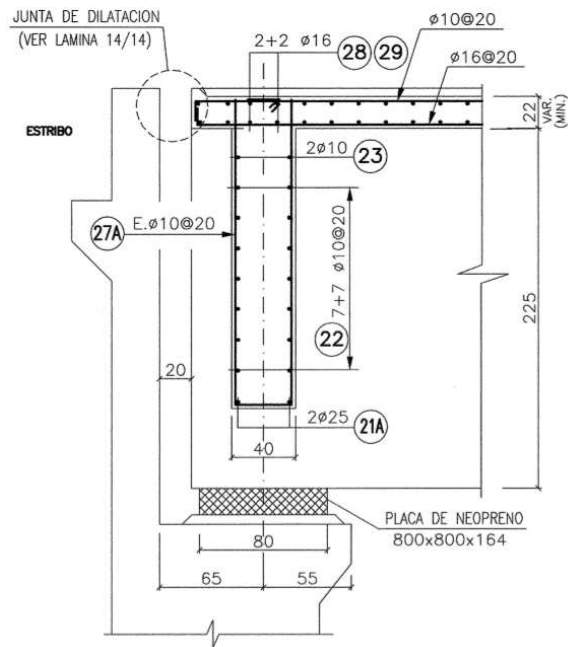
Construction detail for abutment to deck connection (courtesy Ministerio de Obras Públicas, Chile).
